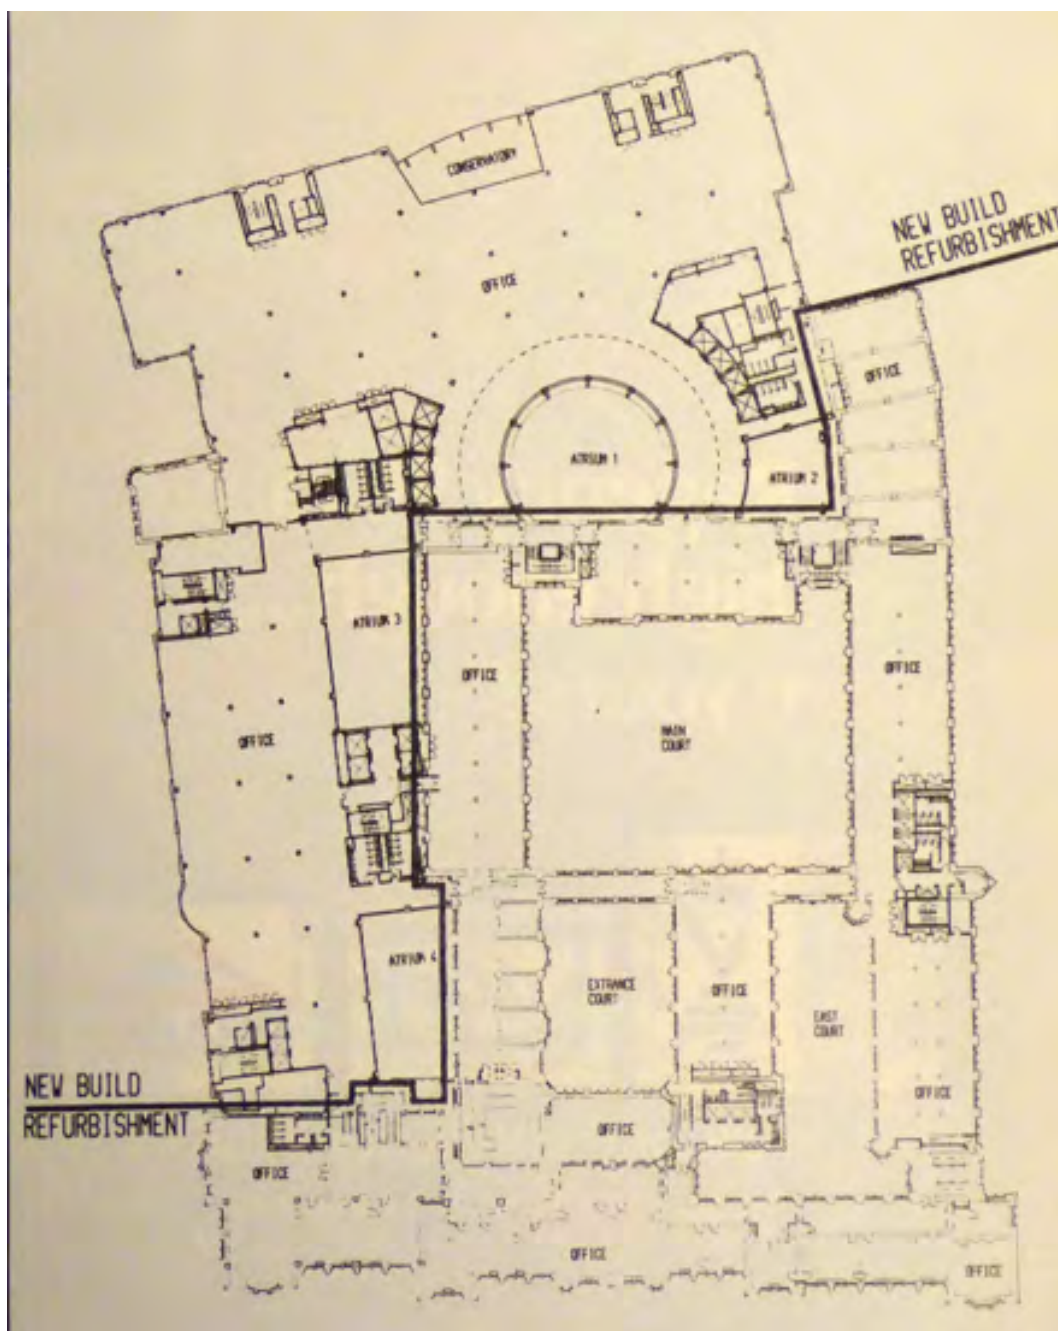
Typical floor plan of the 1993 development showing relation between new and refurbished historic work
